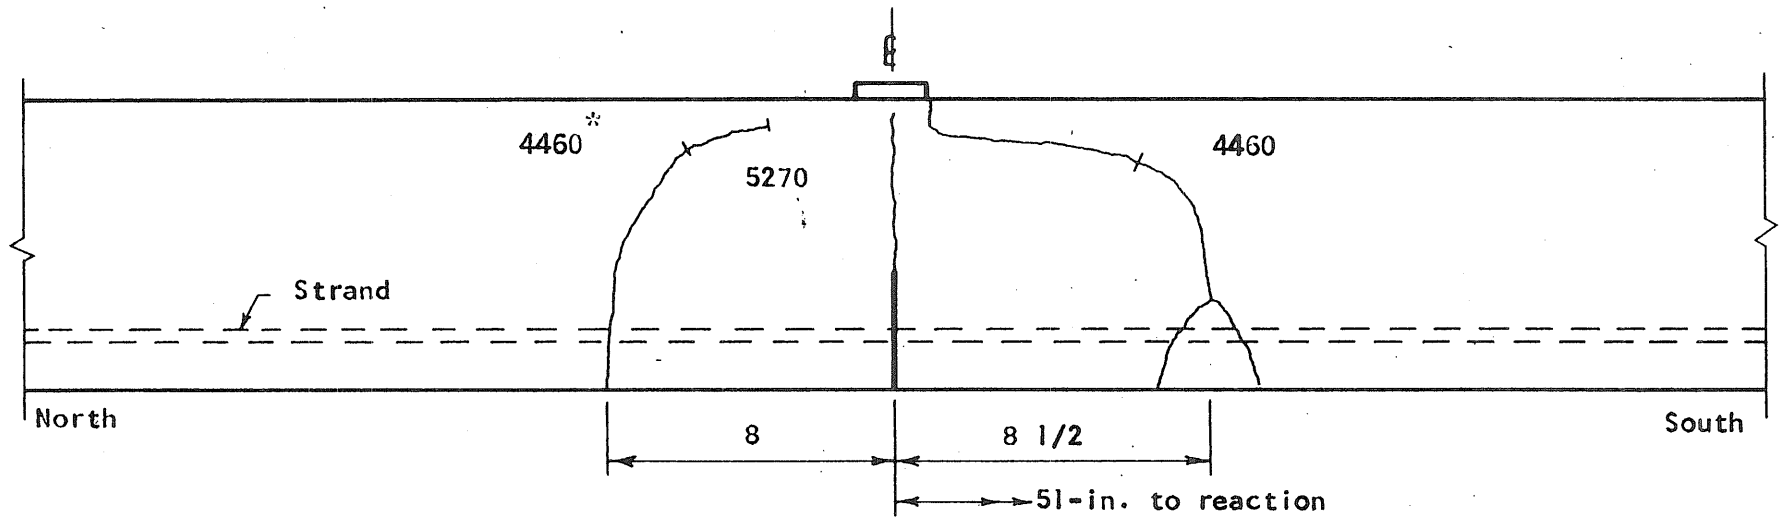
BEAM CRACK PATTERNS
